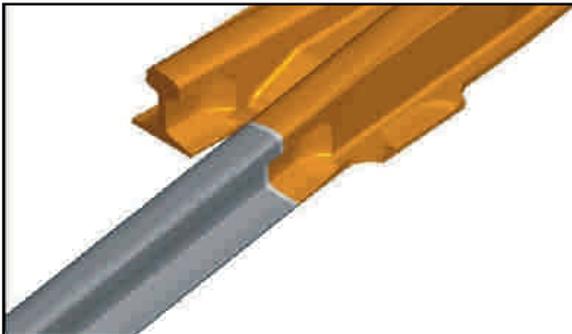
Manganese monoblock crossing with welded legs
